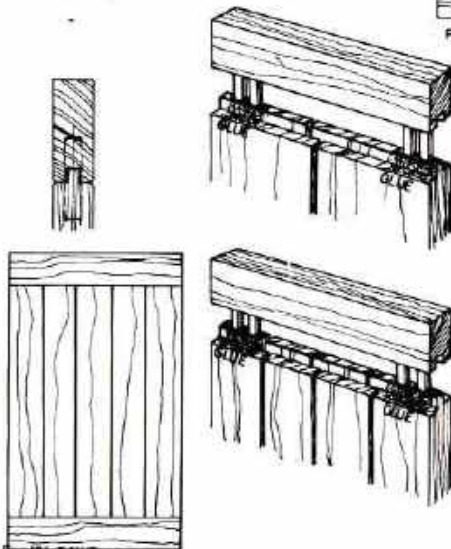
DOWEL AND GROOVE CLAMP JOINT
